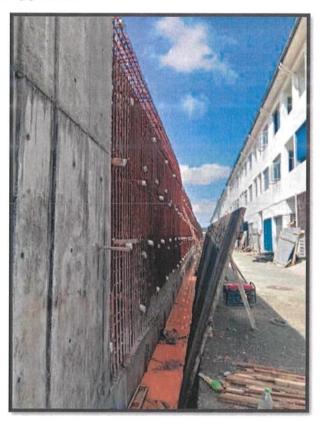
The steel formwork shifted adjacent part of retaining wall.
